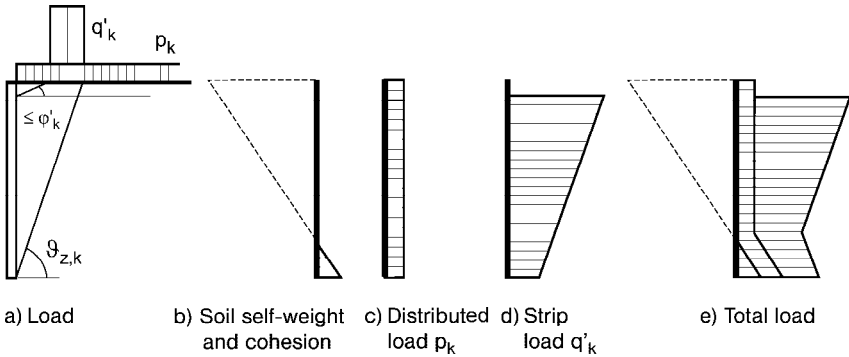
Earth pressure distribution for an unsupported retaining wall, with a fixed earth support in cohesive soil, assuming slip surfaces at an angle $\vartheta_{z,k}$ (example)
